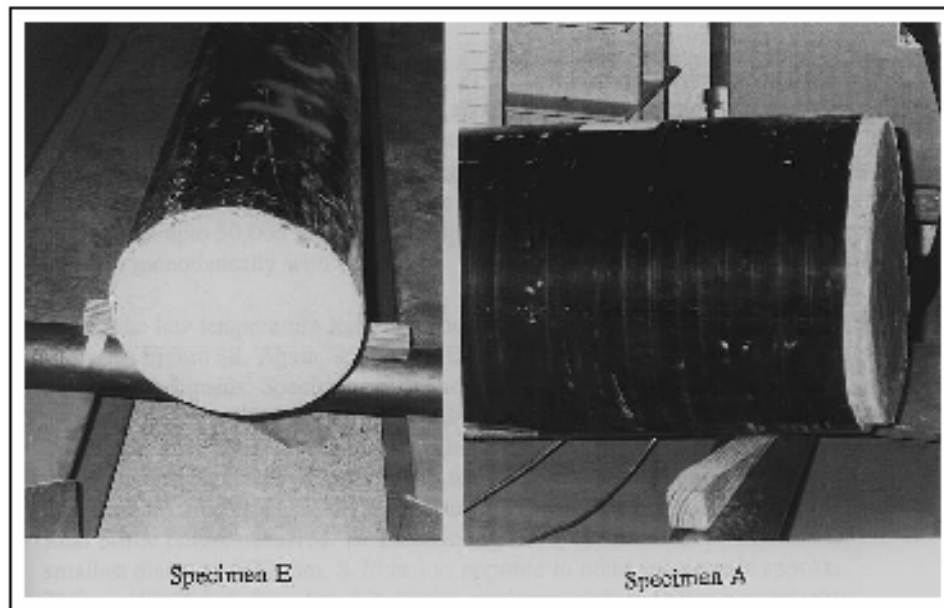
Delamination of a concrete-filled FRP pipe pile during a four point bending test (Lampo et al. 1998).
